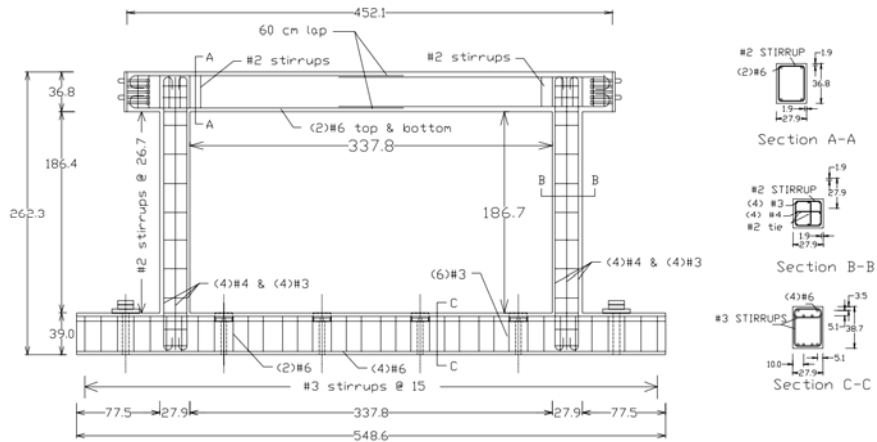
Design of RC frame for Specimen CU1 of Blackard et al. (2009) (units in cm)
